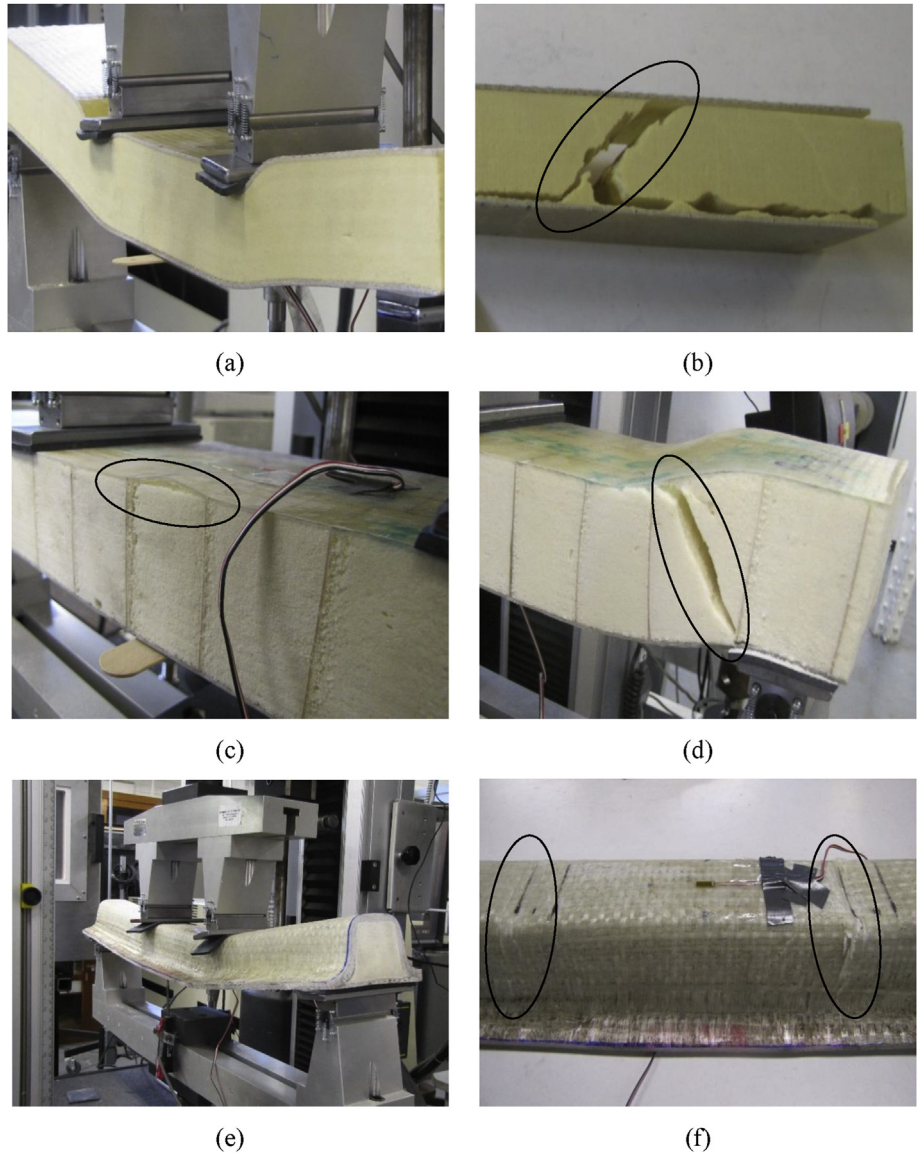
Failure modes: (a) bending fracture, (b) shear failure in Type 1, (c) intercellular buckling, (d) shear failure in Type 2, (e) deformed shape during testing, and (f) compression failure under loading points in Type 3.
